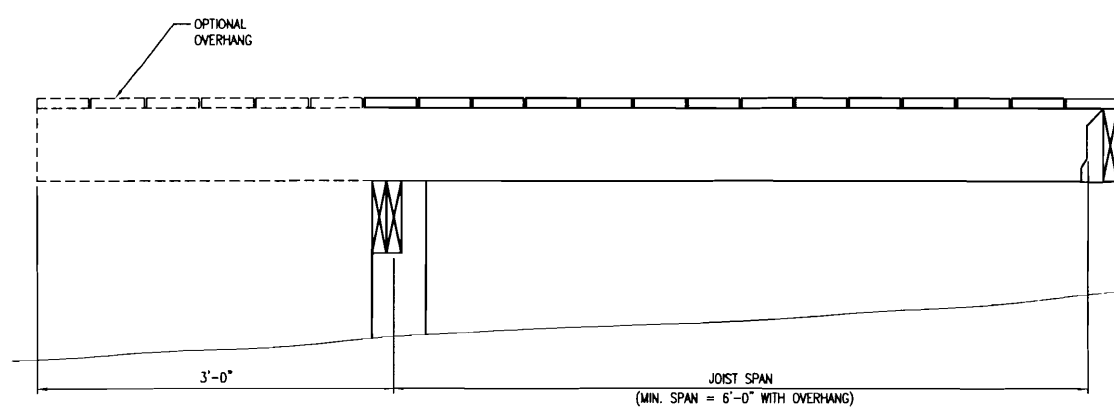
JOIST SPAN - DECK ATTACHED AT HOUSE
